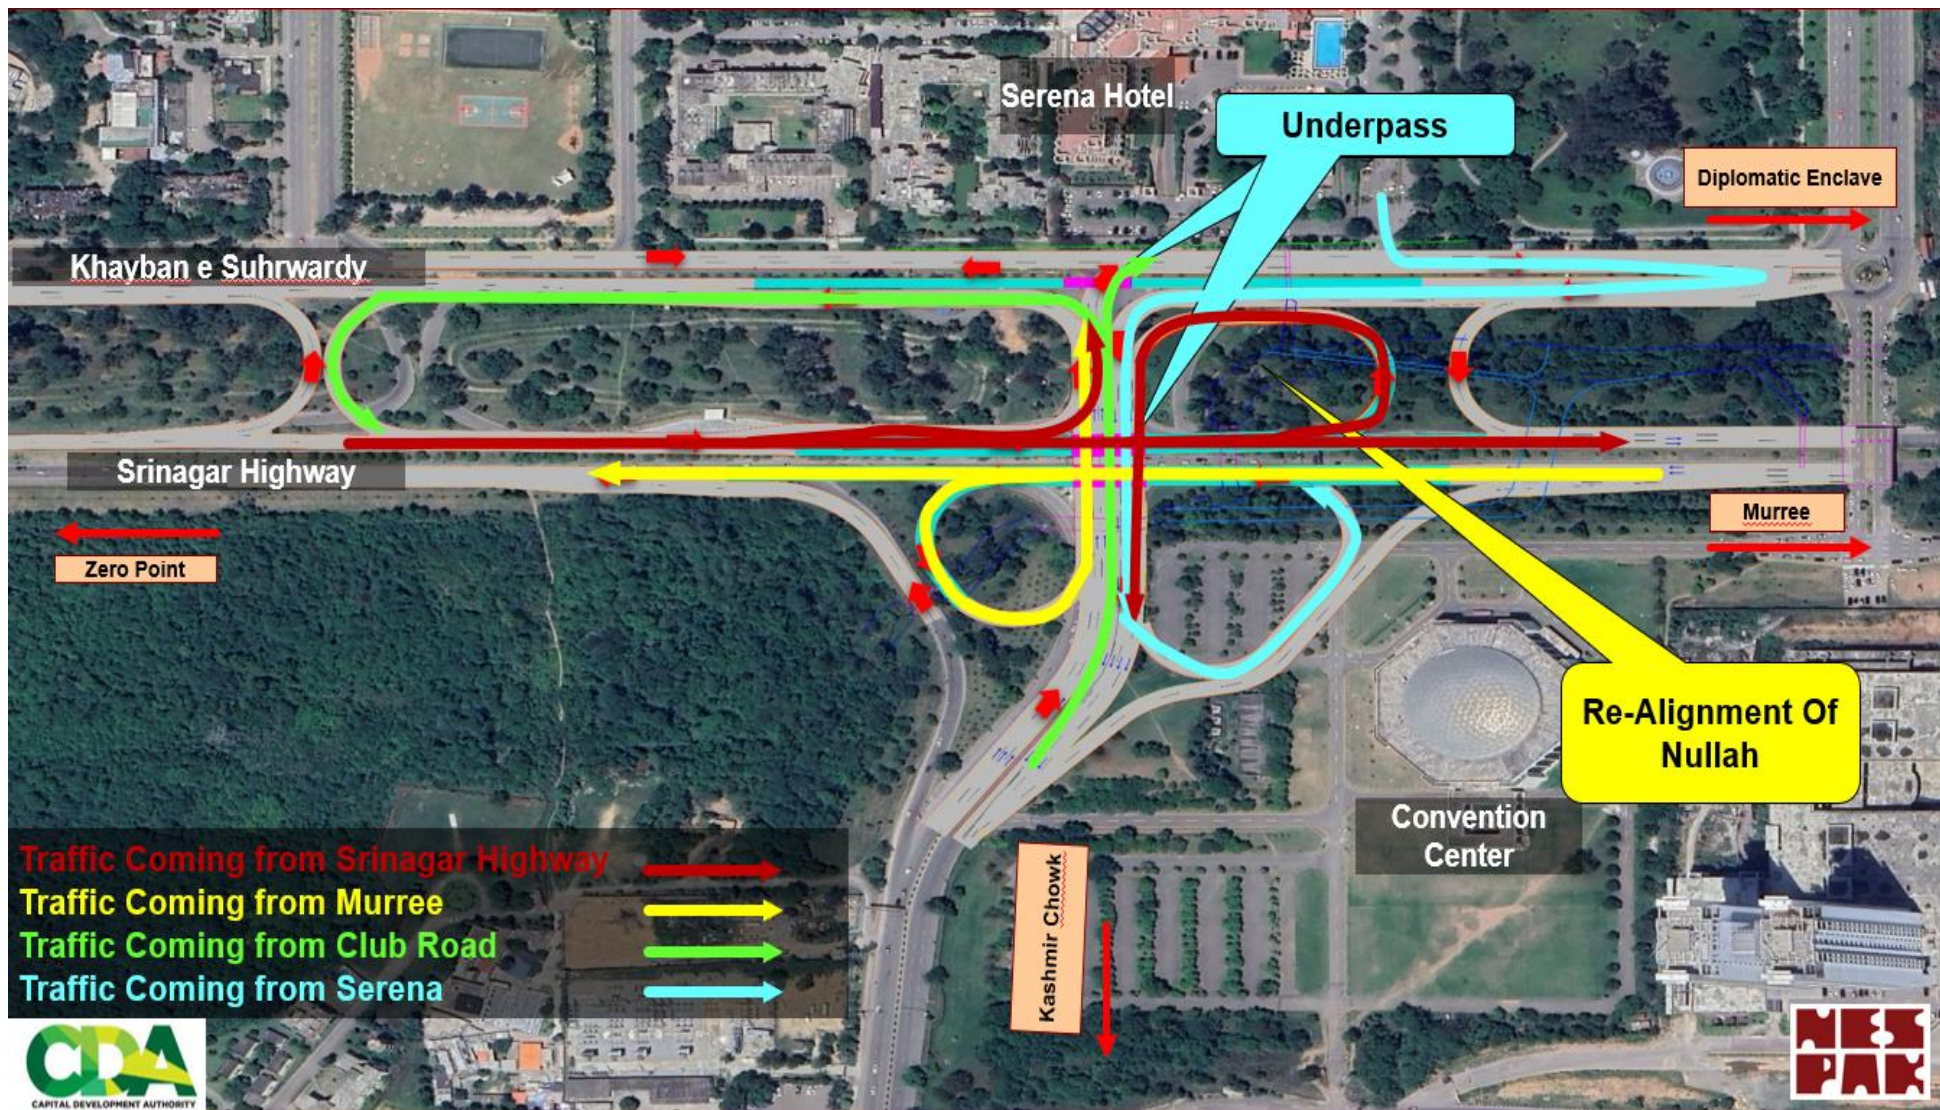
Proposed Traffic Circulation-Serena Hotel Intersection
